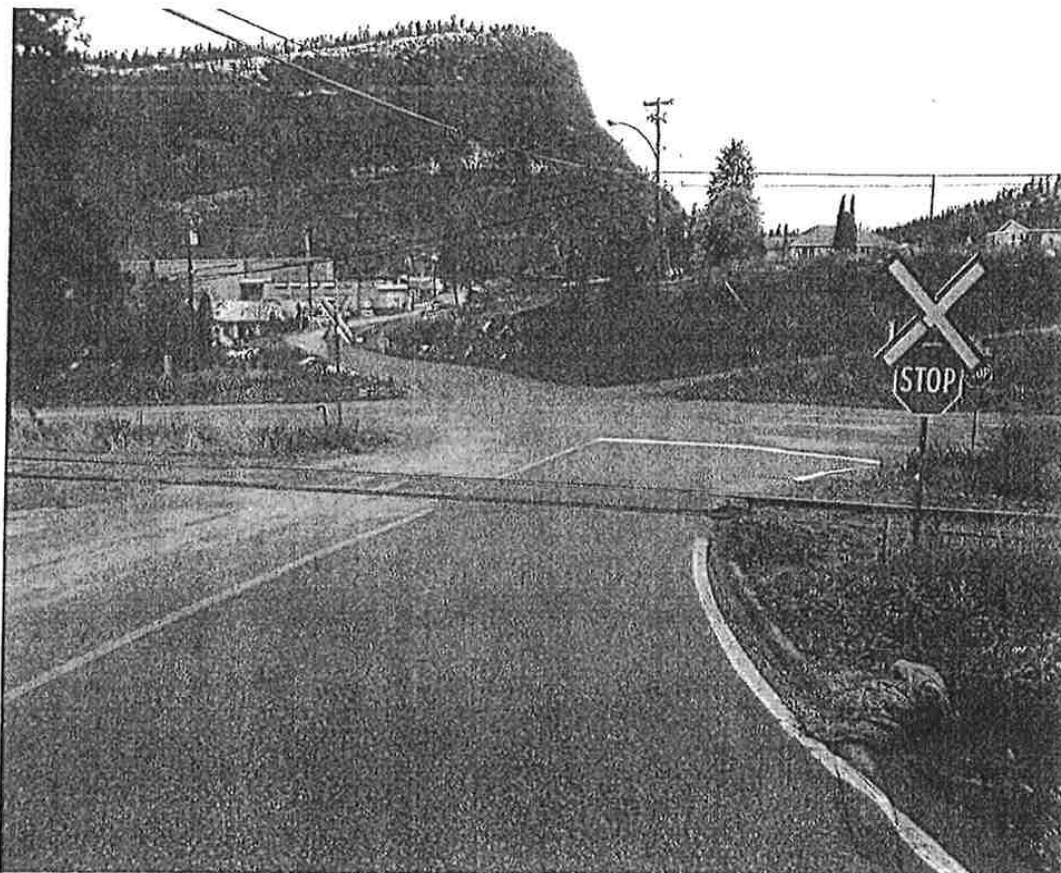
Simpson Road Railway Crossing Summerland BC (View Facing East)
